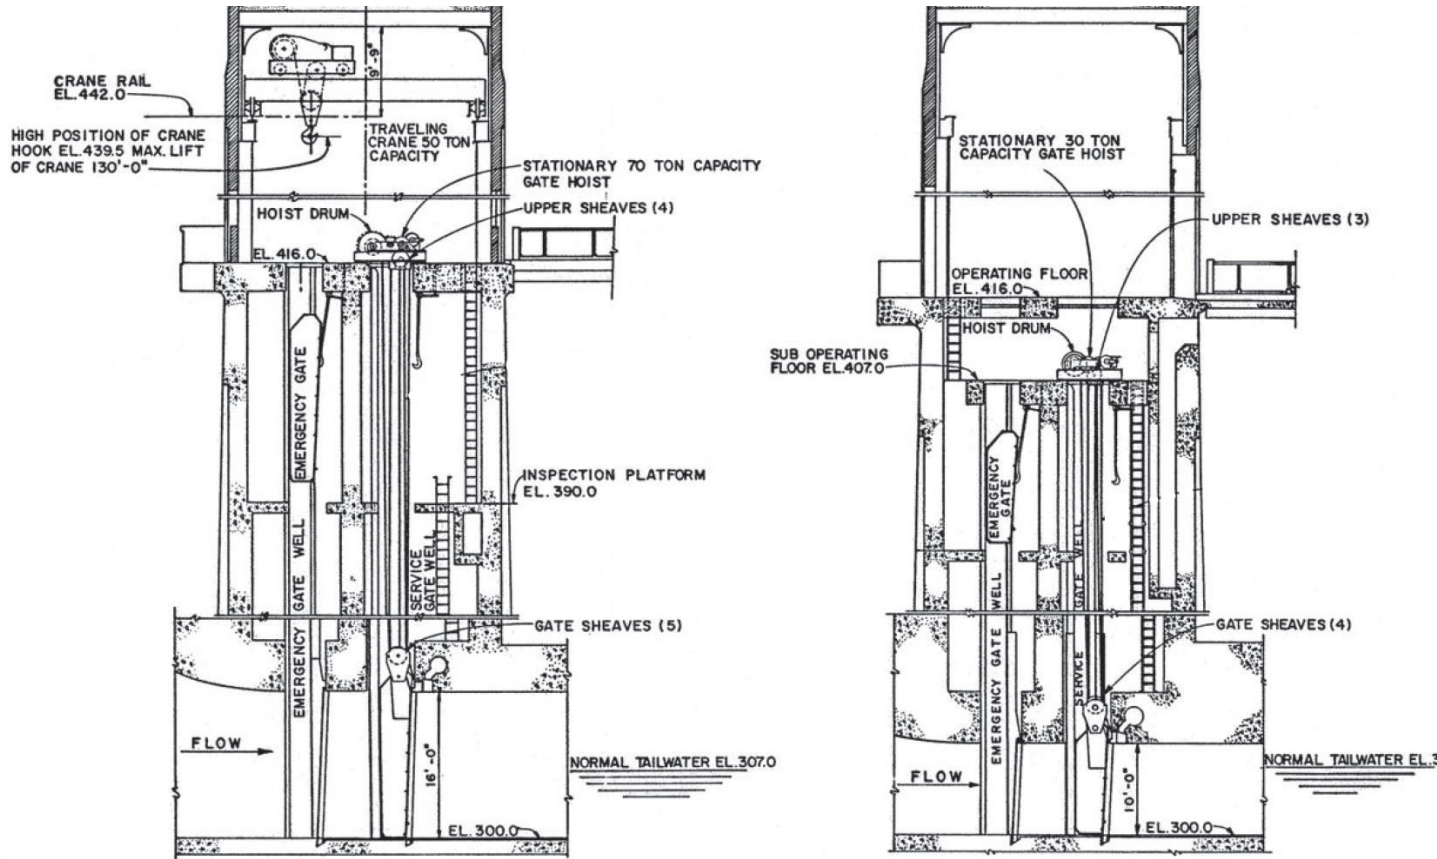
Exhibit C: As Built Drawing [Not to Scale]. General Plan of the Franklin Falls Dam Gatehouse Tower at work areas.
